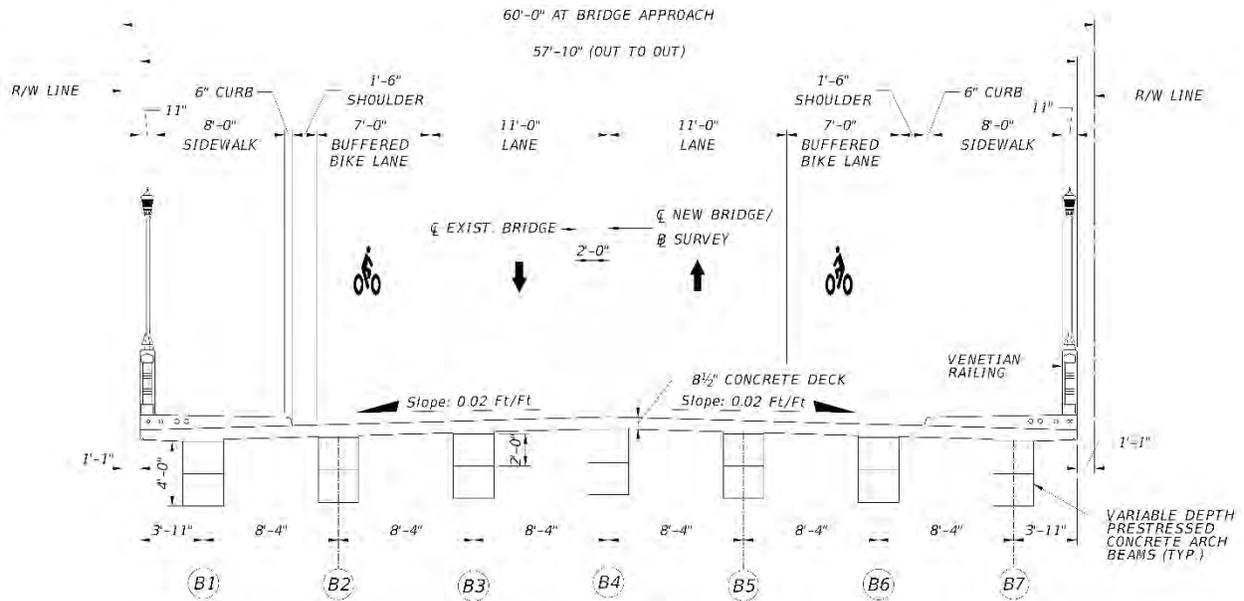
Replacement Alternative 7: Arched Beam Typical Section
